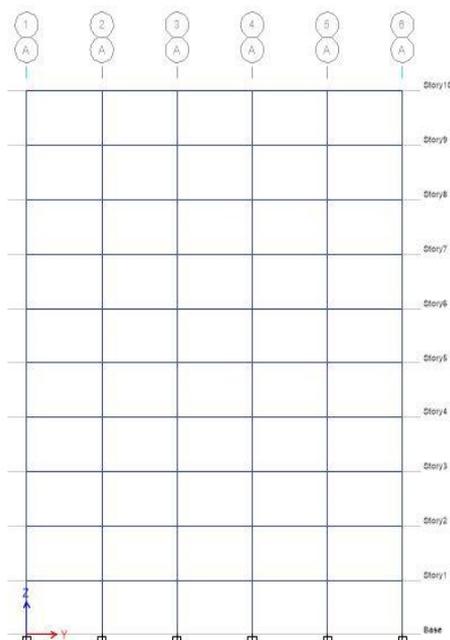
RCC building with Conventional Clay bricks as infill material. (Plan of building with Conventional Clay Bricks as infill material)
